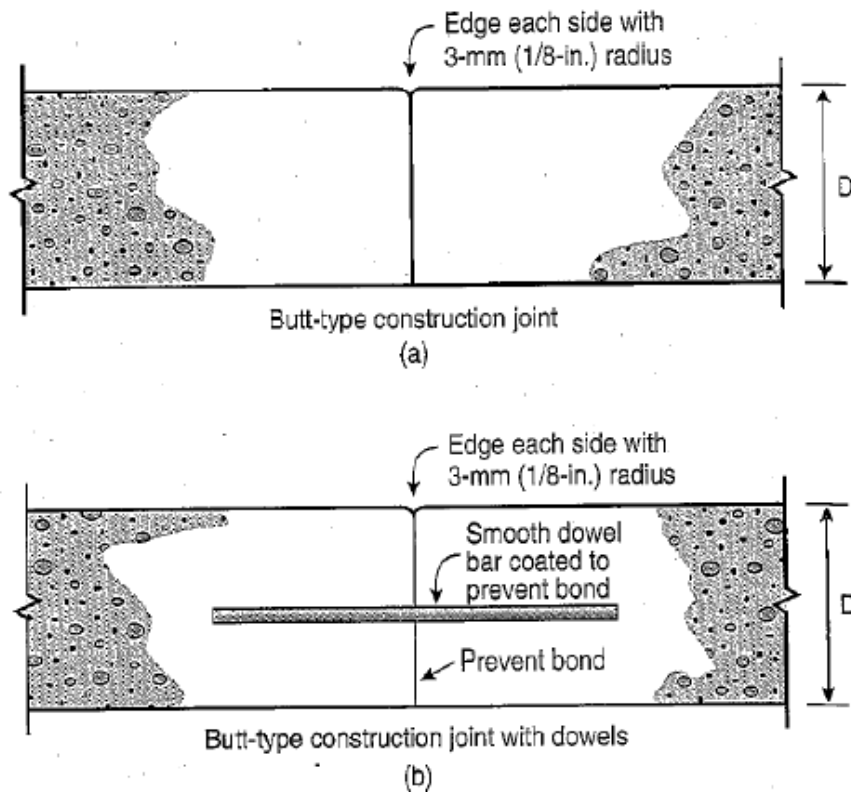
Illustration of (a) Butt construction joint and (b) Butt construction joint with dowel bars (Kosmatka et al. 2002)
